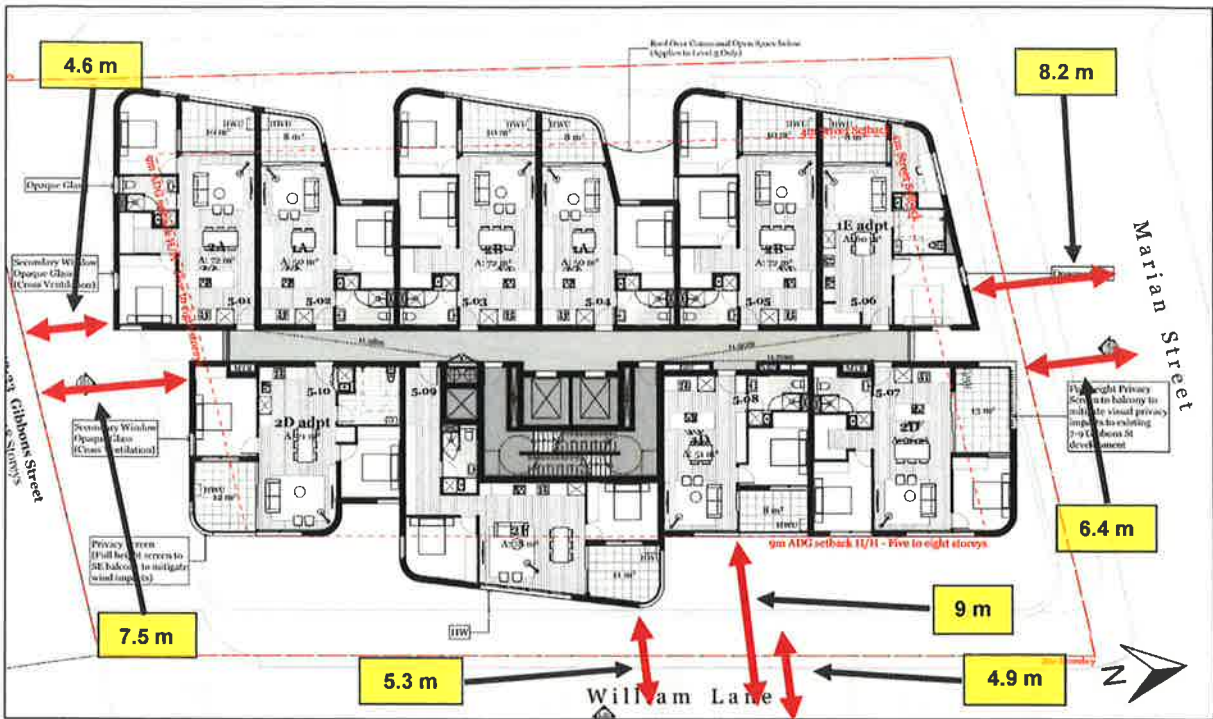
| Variations to recommended ADG setbacks: 4 to above 9 storeys (Base source: Architectural Plans)
